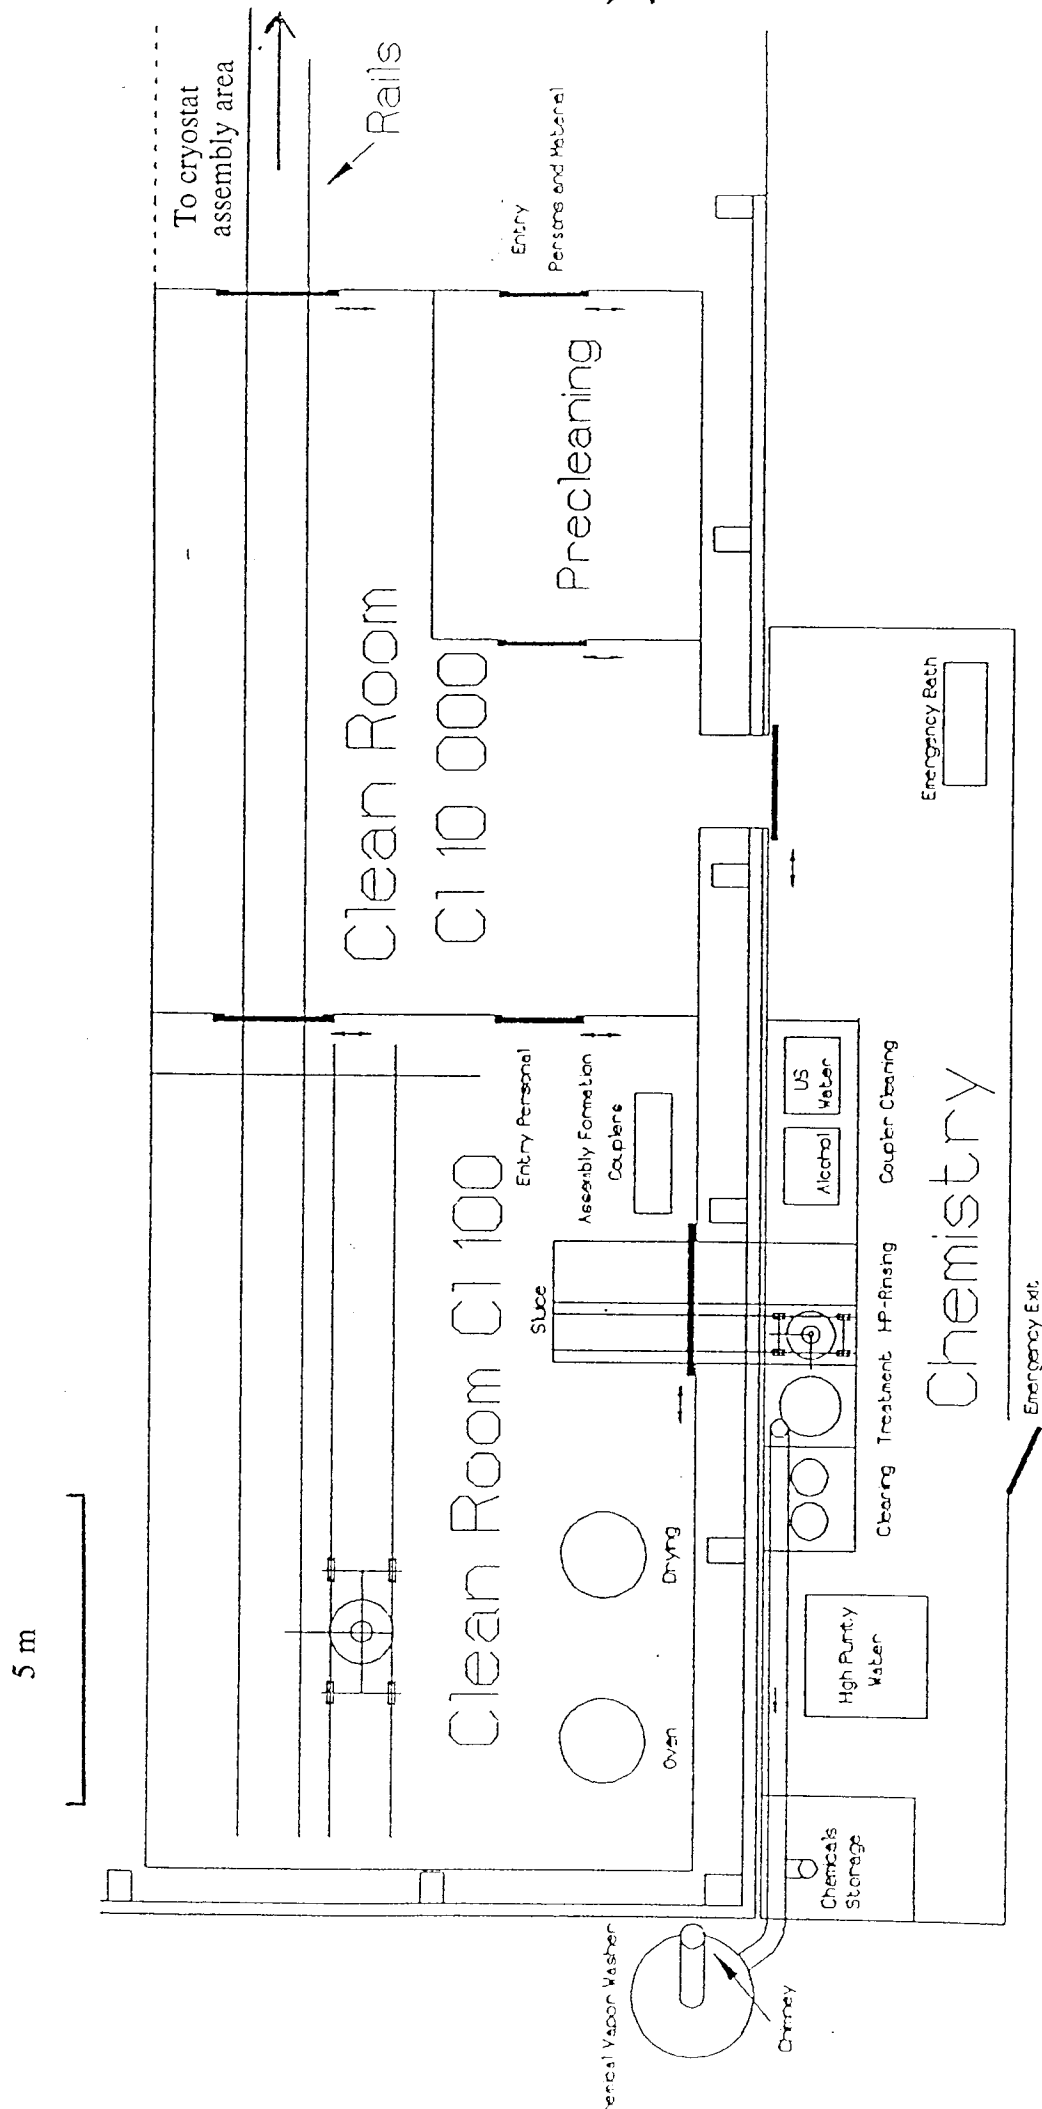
Infrastructure for cavity treatment and assembly.
